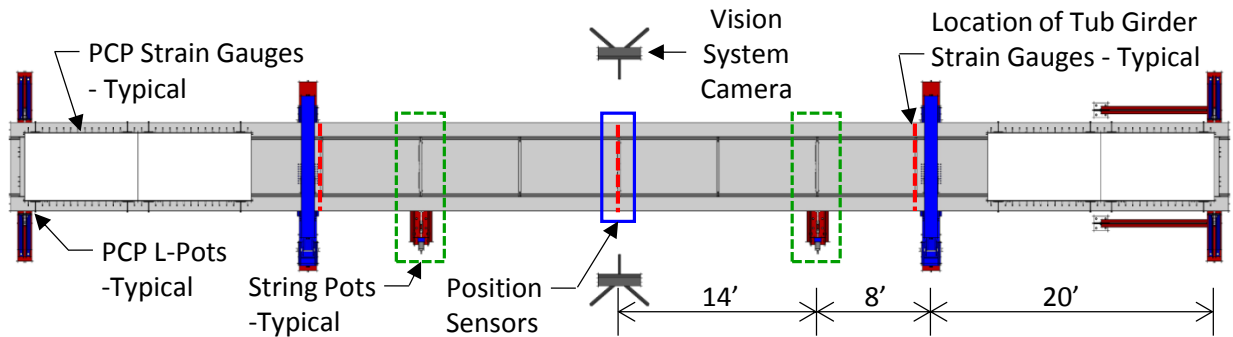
Instrumentation Layout for Simply Supported System – Plan View
